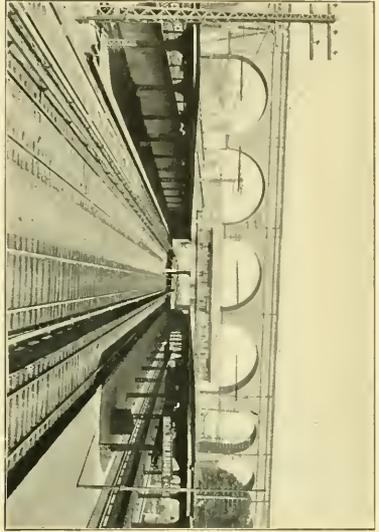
TYPICAL GRADE CROSSING ELIMINATION, WITH OVER-HEAD STATION AND TRACERS BENEATH (HIGH BRIDGE).
